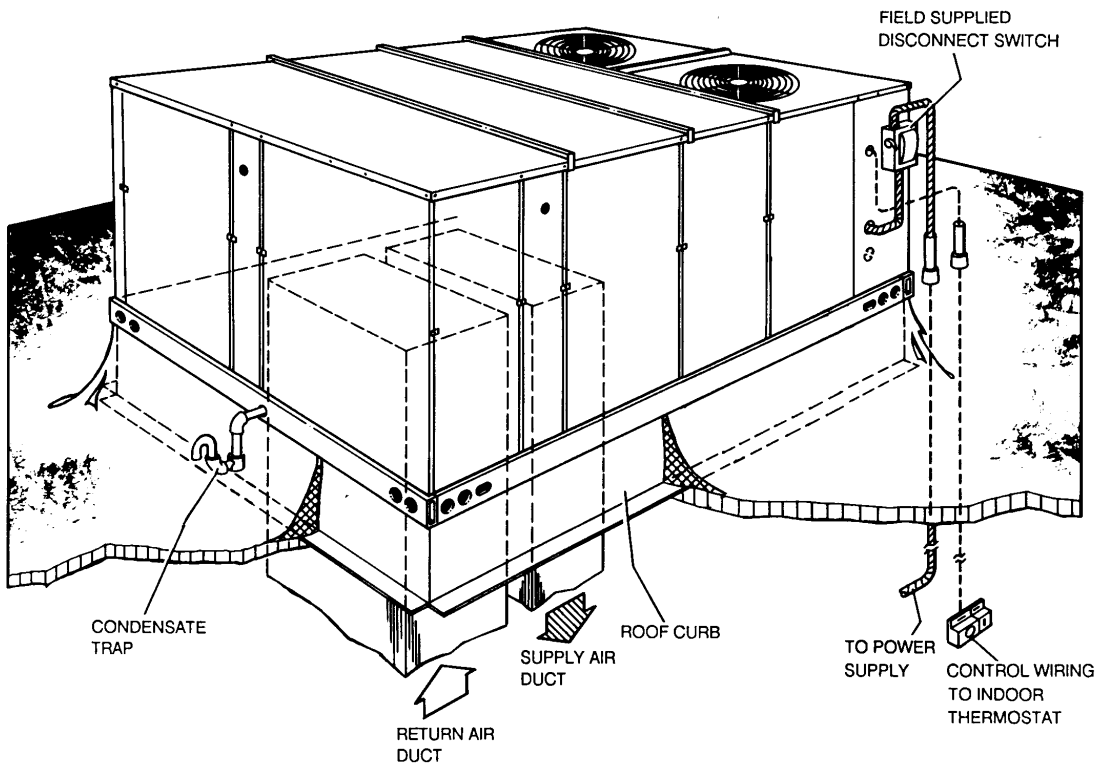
TYPICAL ROOF-TOP INSTALLATION
